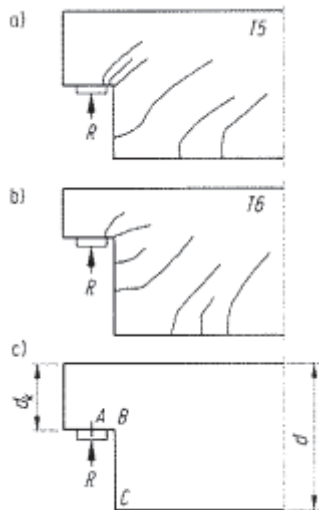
a) and b) crack patterns of test specimens of Steinle (1975)
